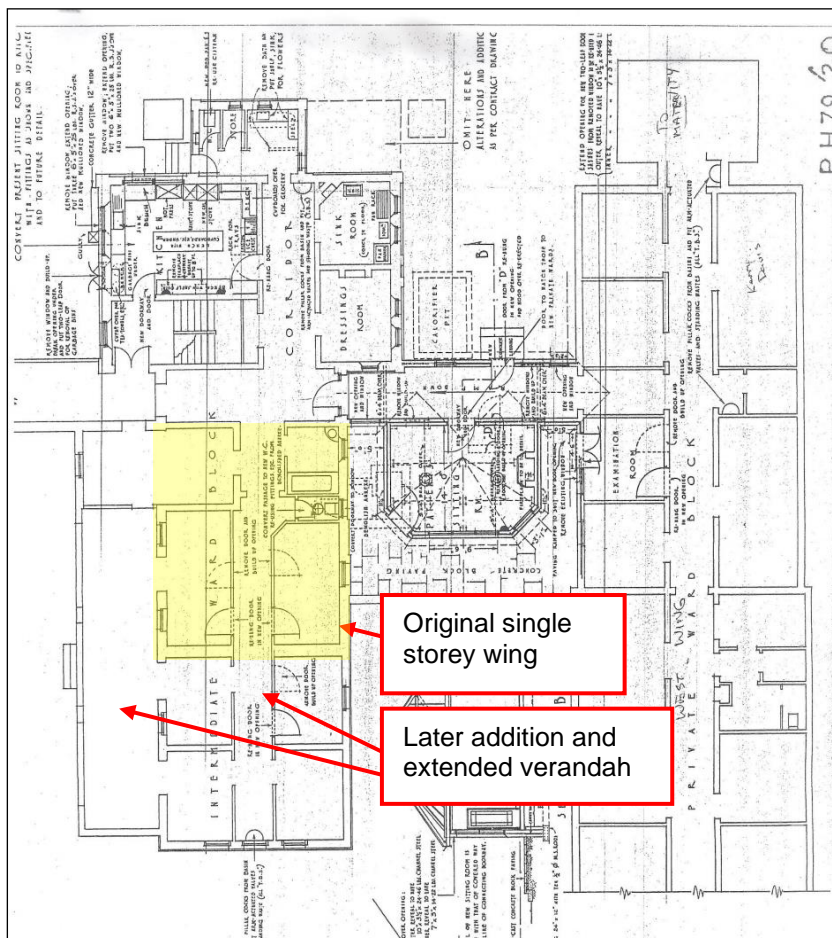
Plan dated 1937 showing the new “Patients sitting room”. The plan also shows the new patients ward (at right, now known as the West Wing) and that additions had been undertaken to the single storey wing of the western pavilion by this time.
